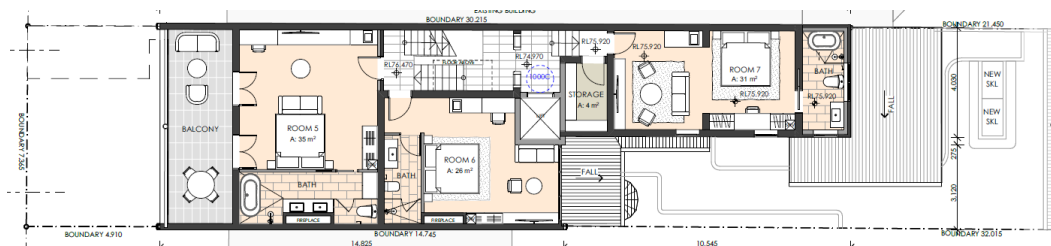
Proposed basement 1 east floor plan – 40 The Avenue, Randwick (Source: PTI Architecture)
